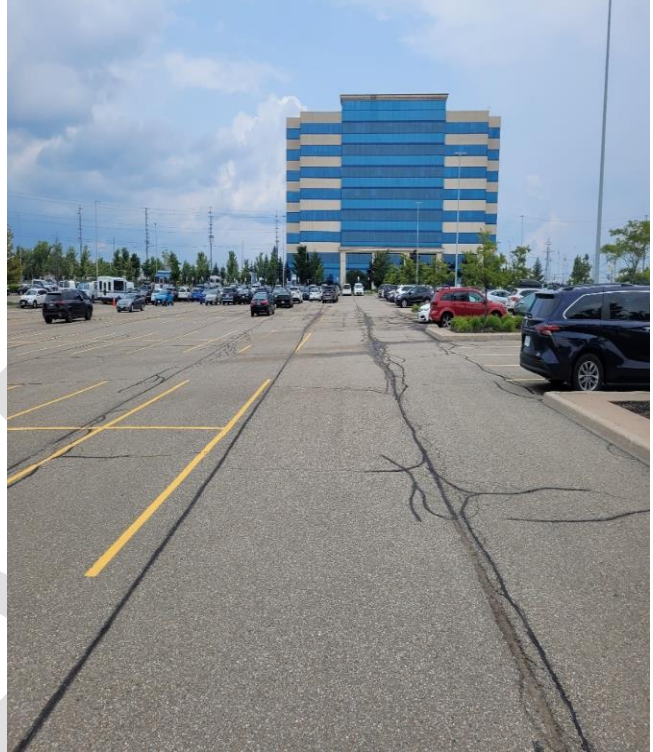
Overview of the existing building. Note the light standards and grade of the parking area, sloped to lead to storm drainage grate, view east.
